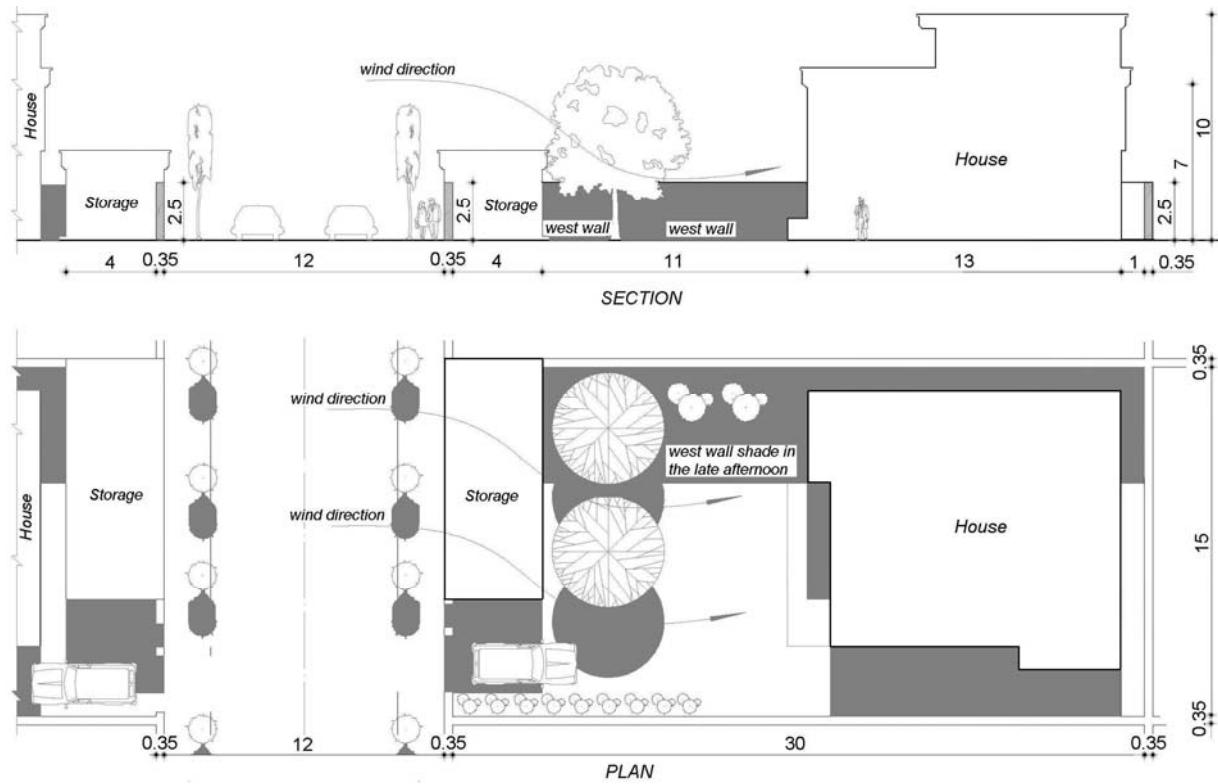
Boundary wall section and plan shows the height and width. It acts like a rectangular ring around the house (Drafted by the author).
